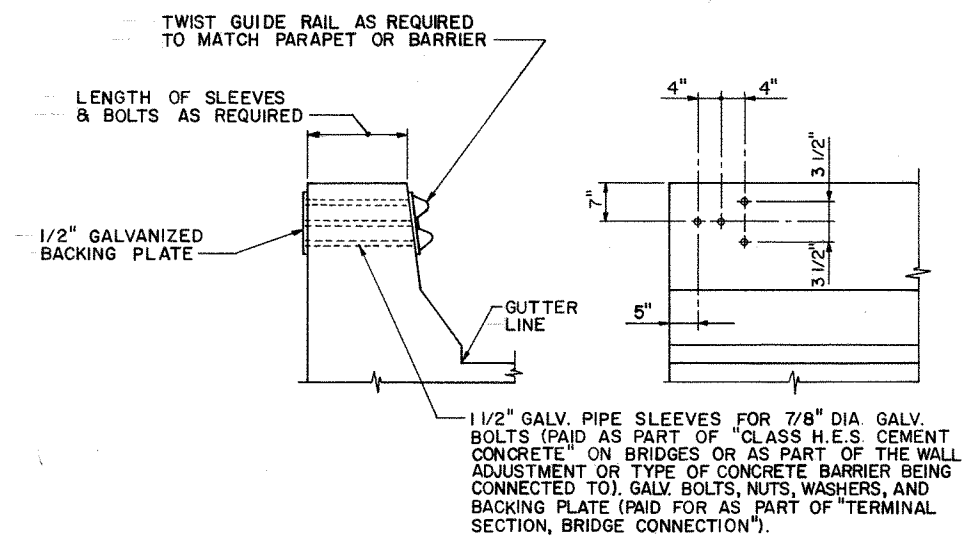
DETAIL OF GUIDE RAIL CONNECTION TO CONCRETE BARRIER
